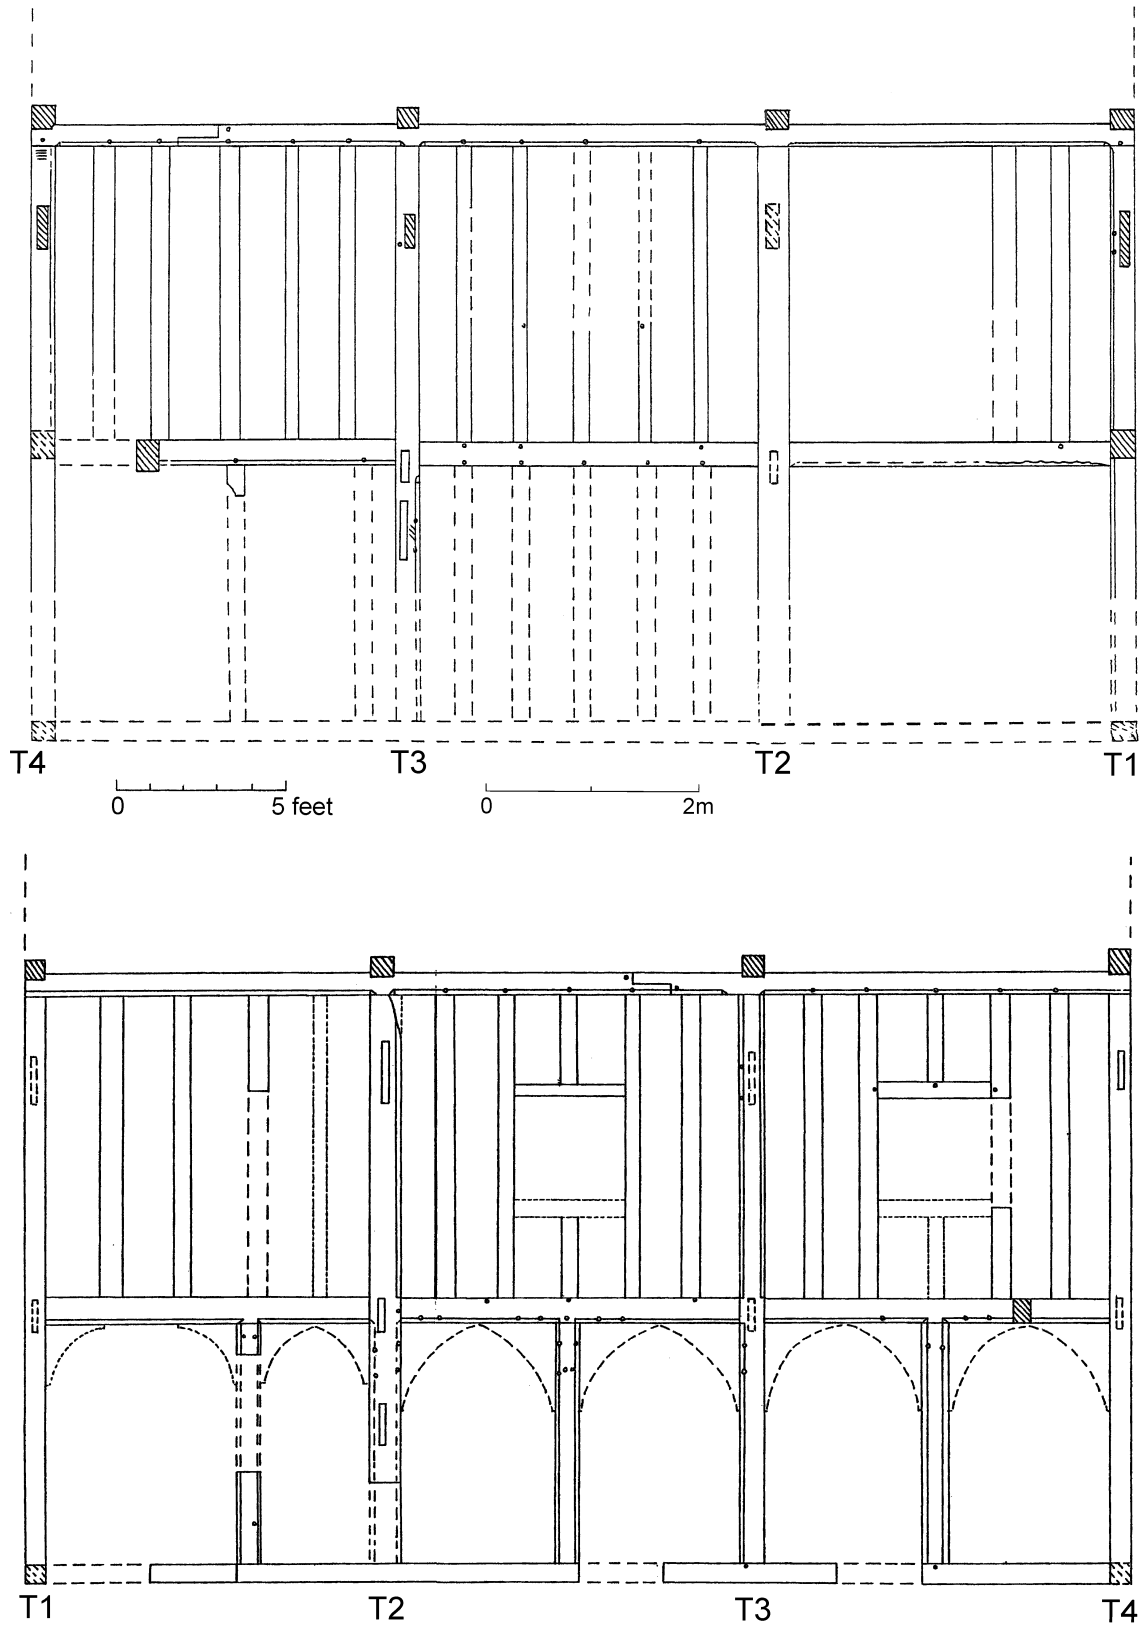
Nos 66–70 Nunnery Road, Castle Hedingham, elevations of the front wall from inside (bottom) and of the rear wall from the inside (top).
